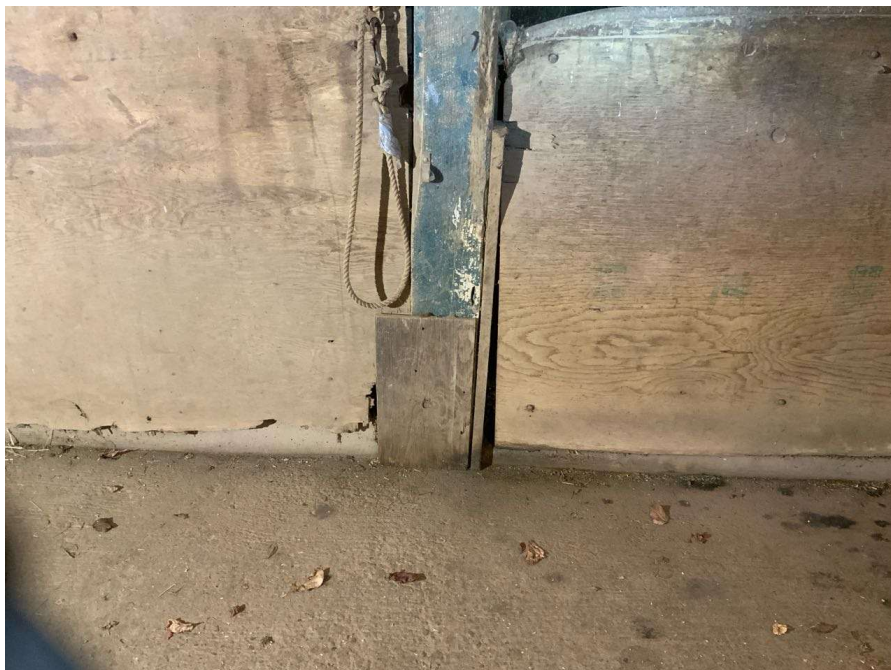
Bearing loss at Column M/2.5 at grade level (looking east). A block of wood was added to hide hole.
